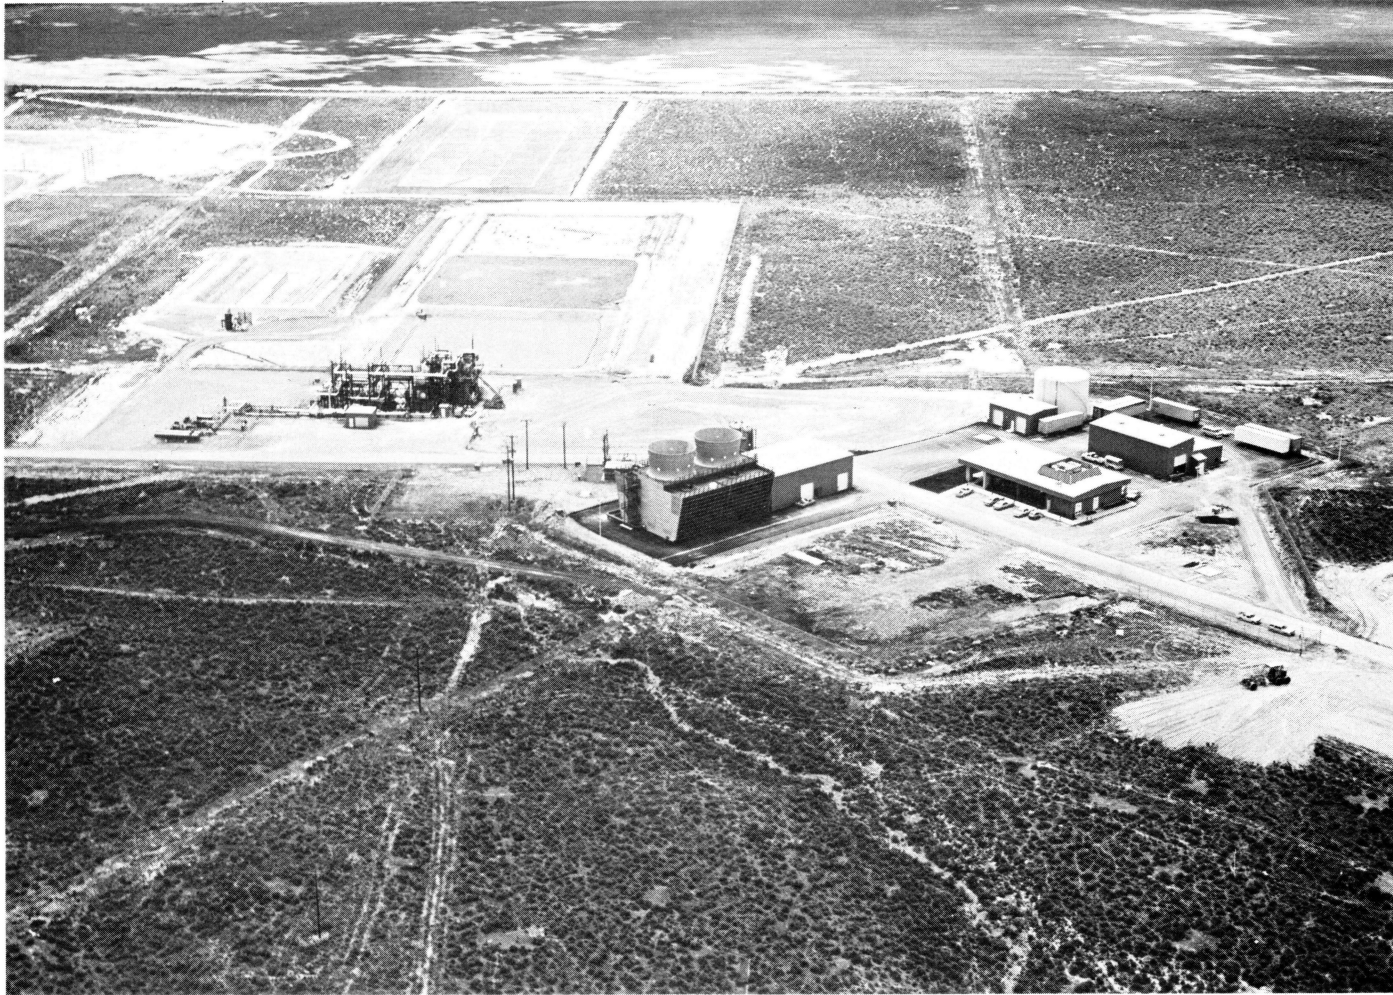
AERIAL VIEW 5MW PILOT PLANT FACILITY
